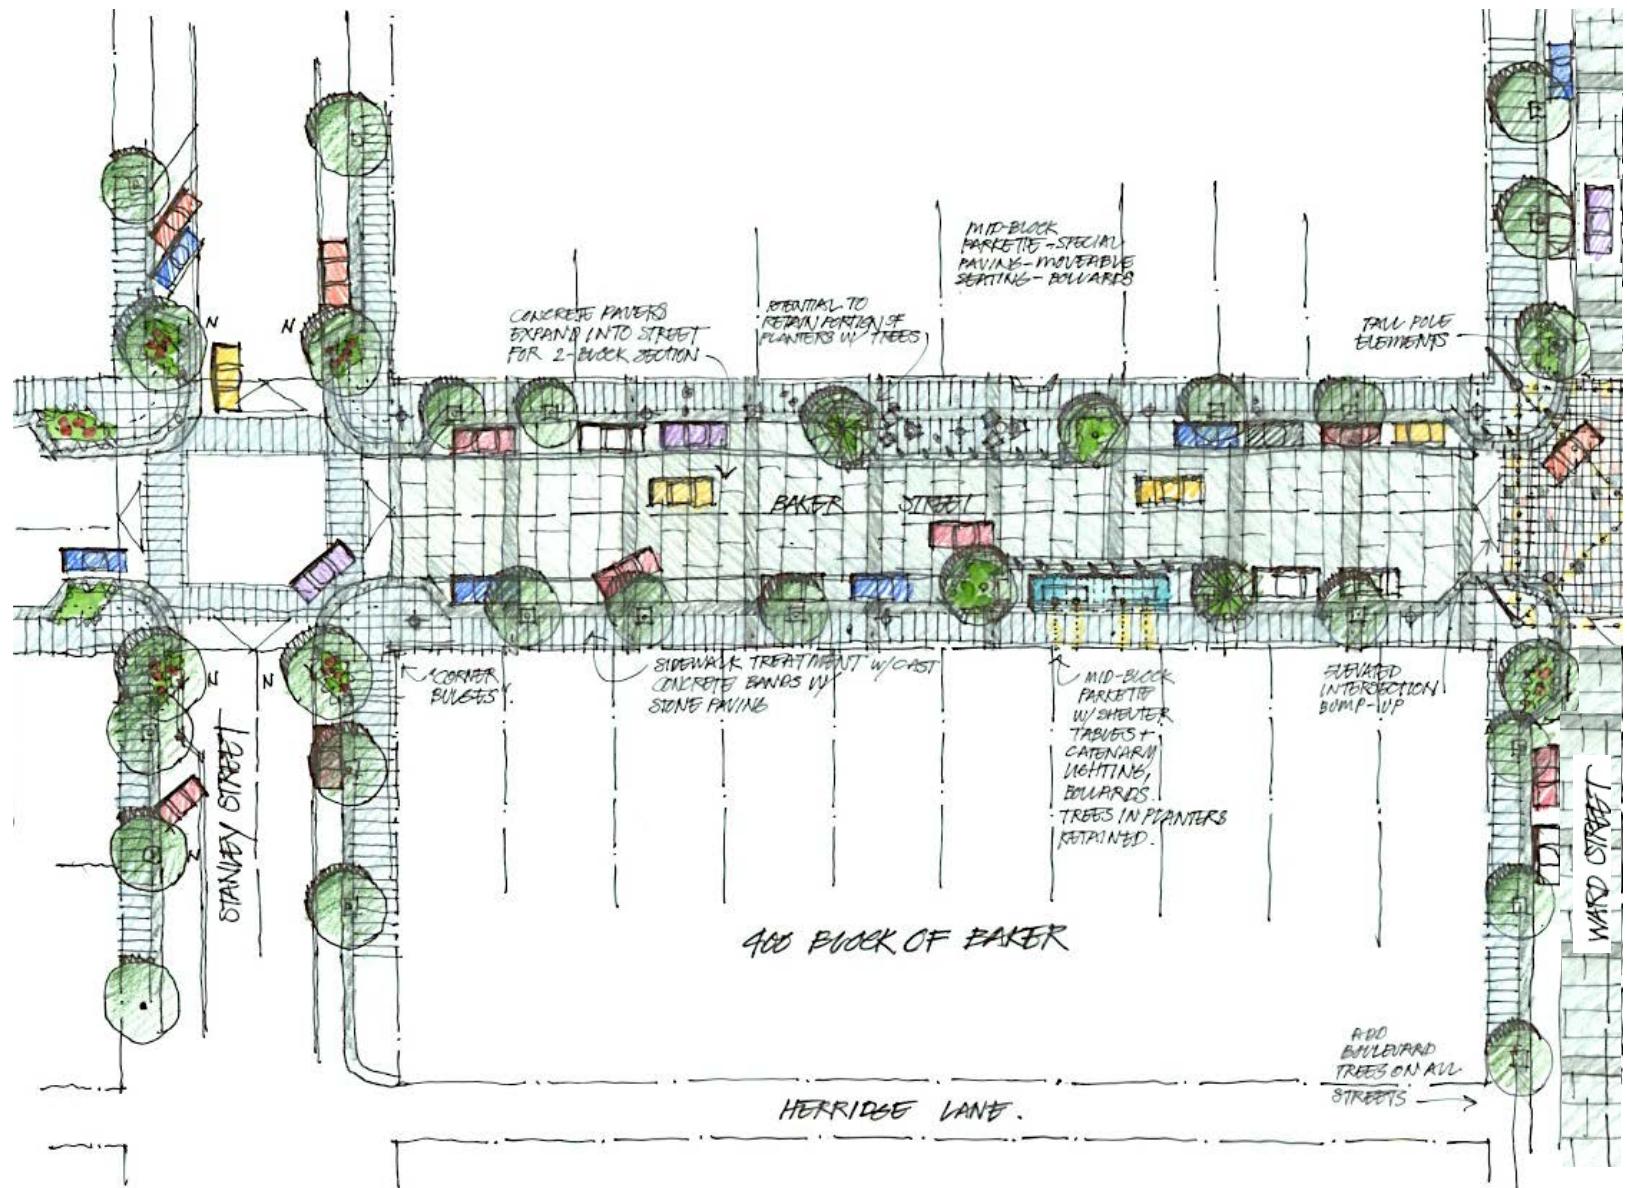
Redesign concept plan for Baker Street from Stanley Street to Ward Street with the recommendation to expand this treatment east to Hall Street and west to Kootenay Street to complete a four block core section in the downtown.
